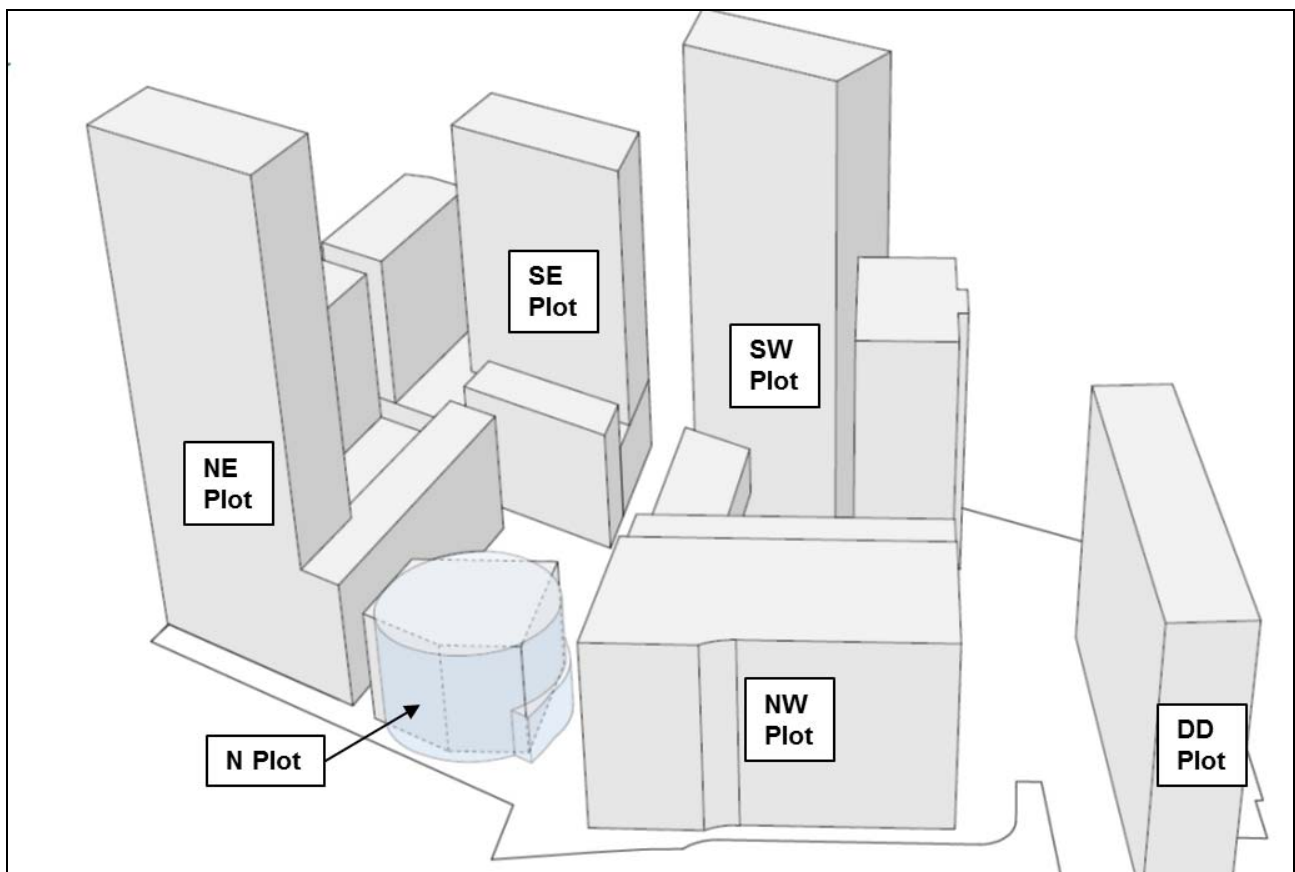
Built form massing comparison between the approved and proposed North Plot building envelope
